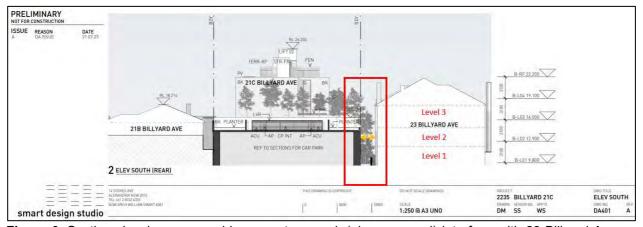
Section showing proposed basement car park (above ground) interface with 23 Billyard Avenue, drawing DA401 Rev.A (Smart Design Studio) Annotation added
